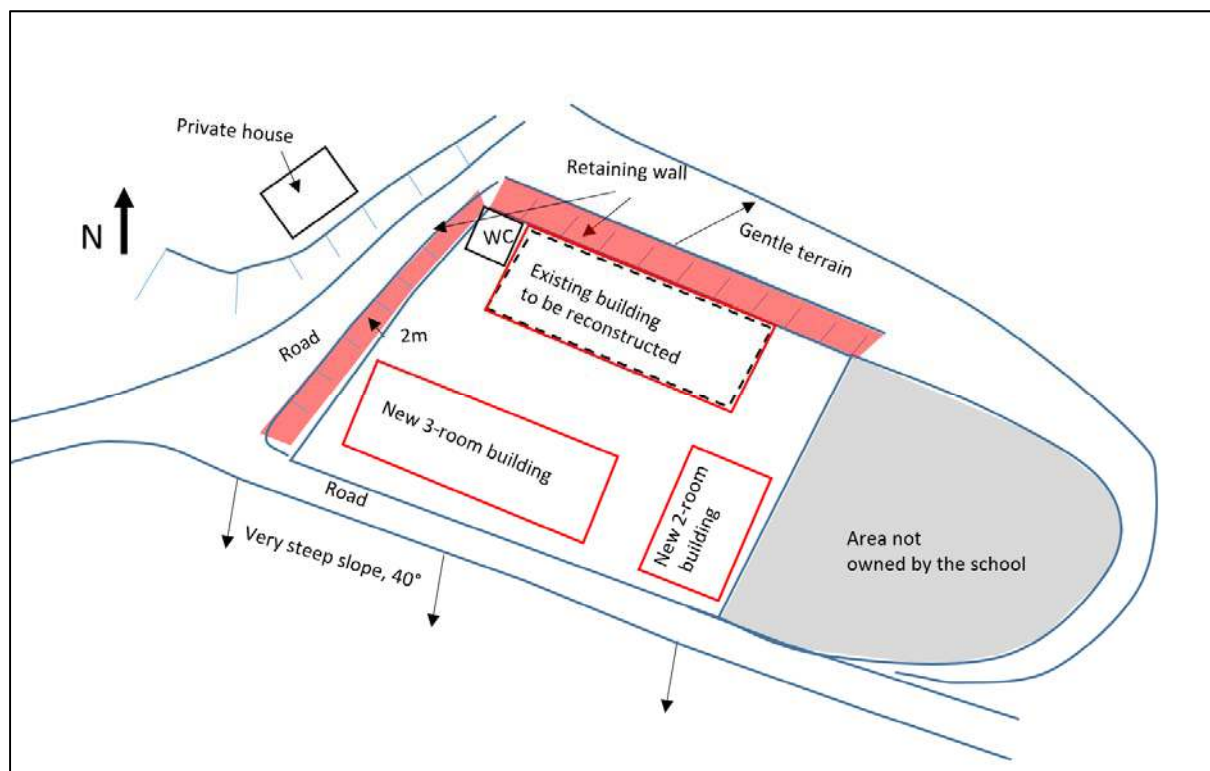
Plan view - Gyalsung school. Big flat plot. Retaining walls should be constructed in north-west to stabilize the road, and in north to stabilize existing building. The position of the 2-room is proposed either in east, as in the figure, or in west of the plot.
